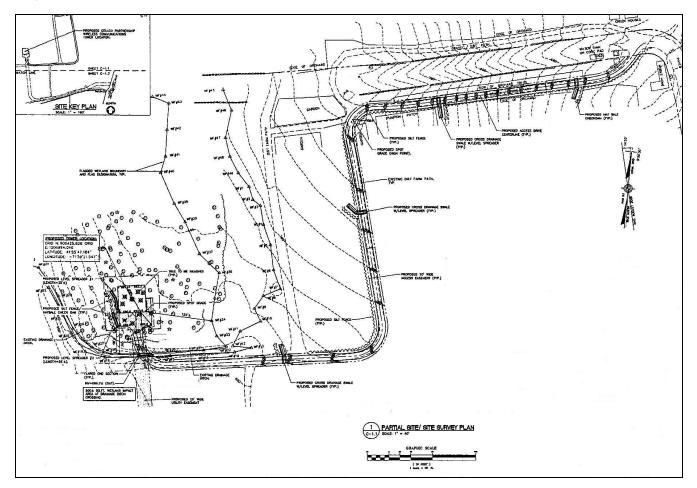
Proposed Cellco site plan. (Cellco 1, Tab 1)
